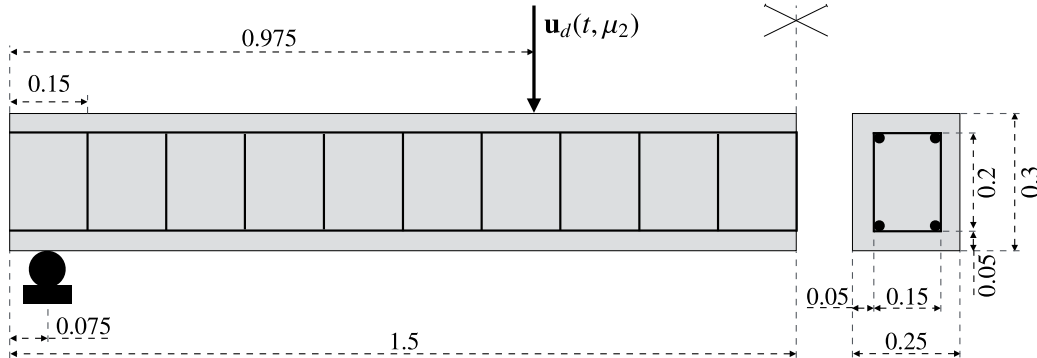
Bending test – longitudinal (half representation, left) and transversal (right) geometry of the reinforced beam (in m)
